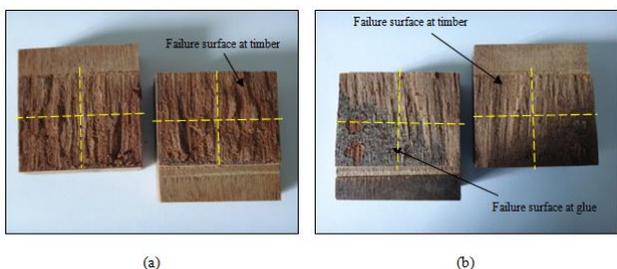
Surface Failures for Melagangai Test Blocks; (a) Cohesive Failure at 100% of Wood Failure; (b) Cohesive Failure at 75% of Wood Failure
